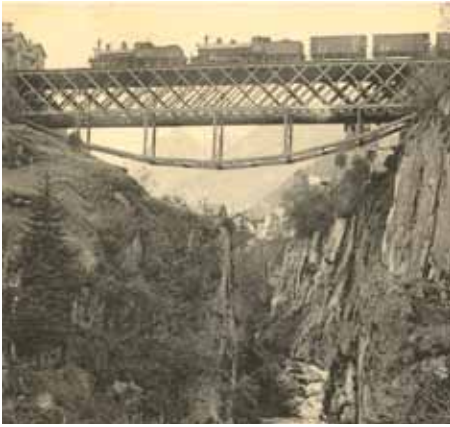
Lattice Truss, Goeschenen, Switzerland. Author's post card collection.
